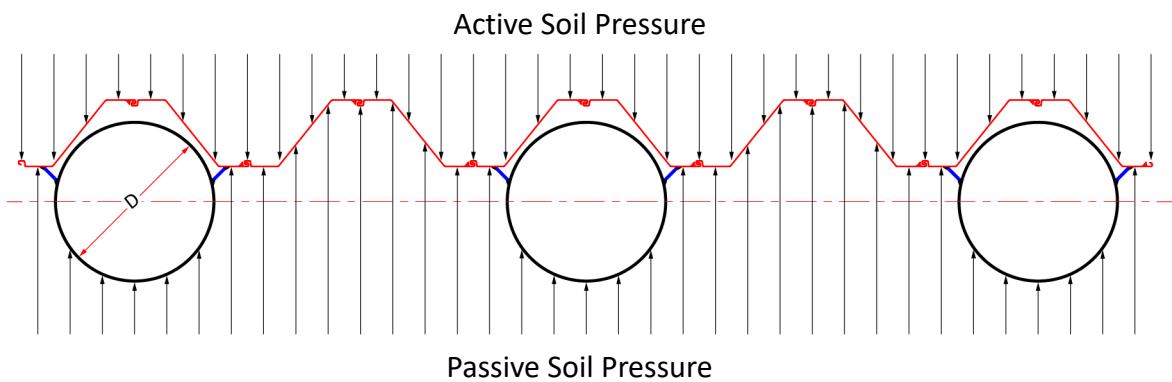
(c). Earth pressure diagram - Plan in section B-B (Pattern A, above SSP toe level)
